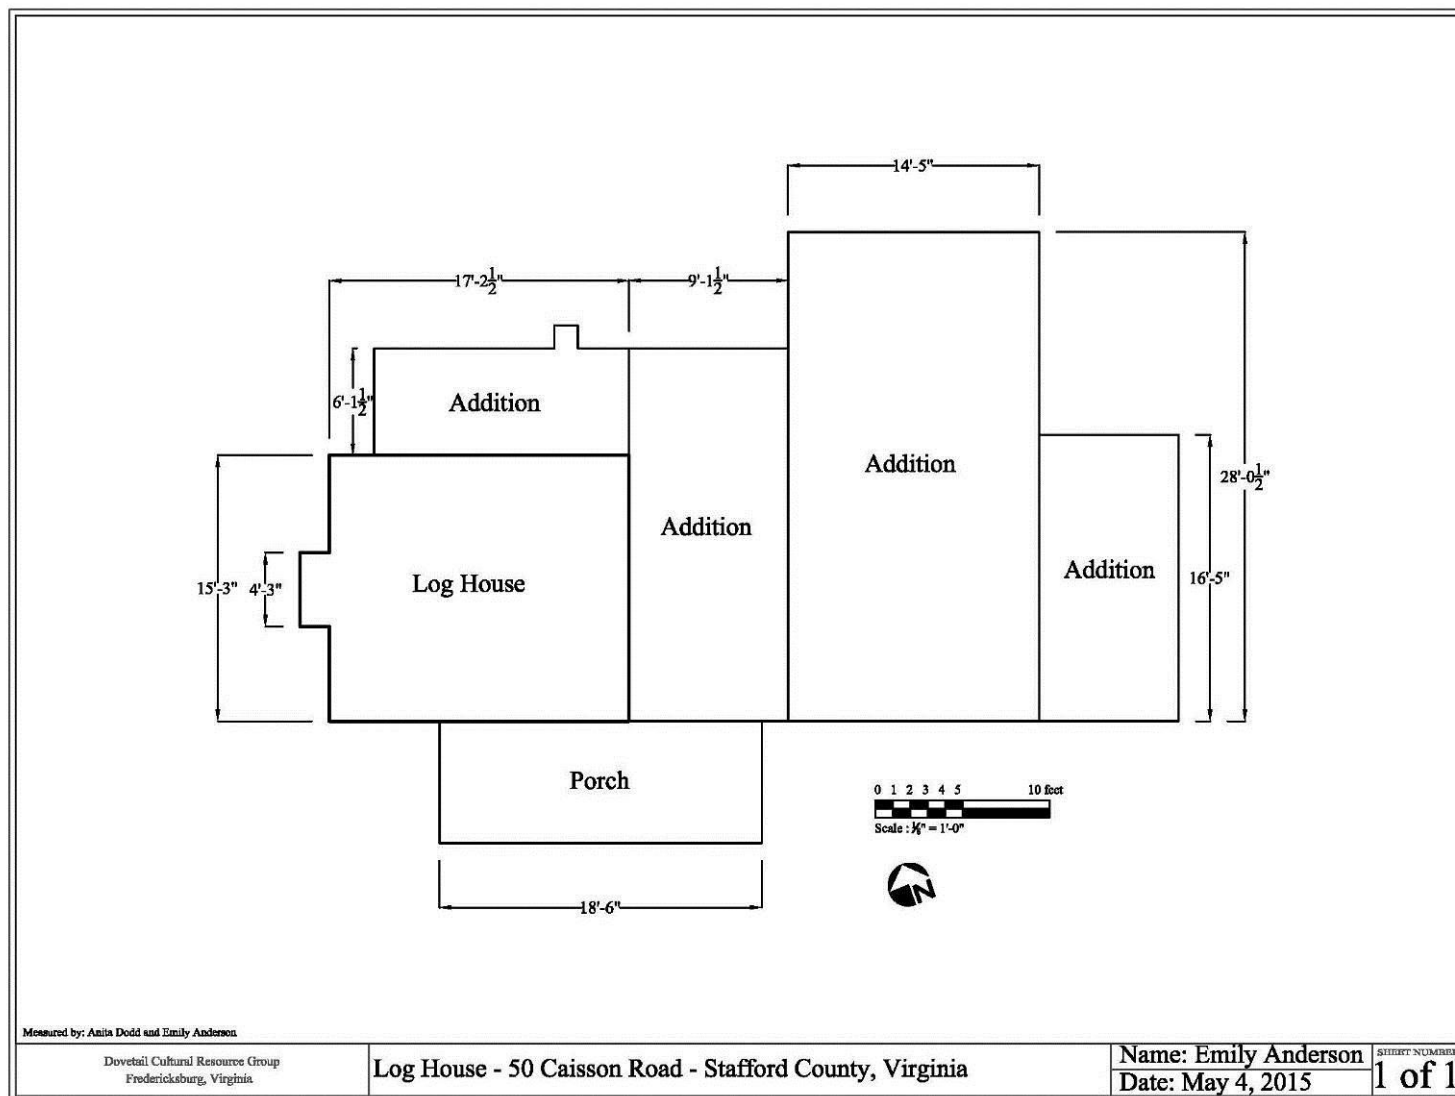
Measured Exterior Plan of 50 Caisson Road.
